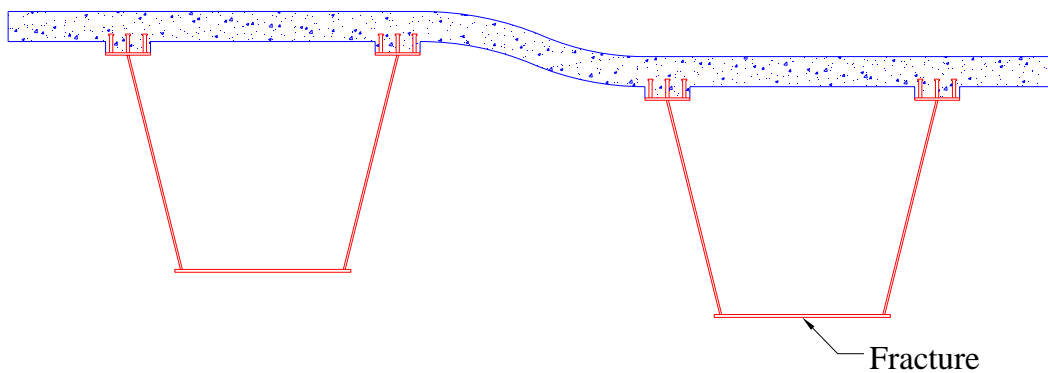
Assumed deflected shape at point of girder fracture
